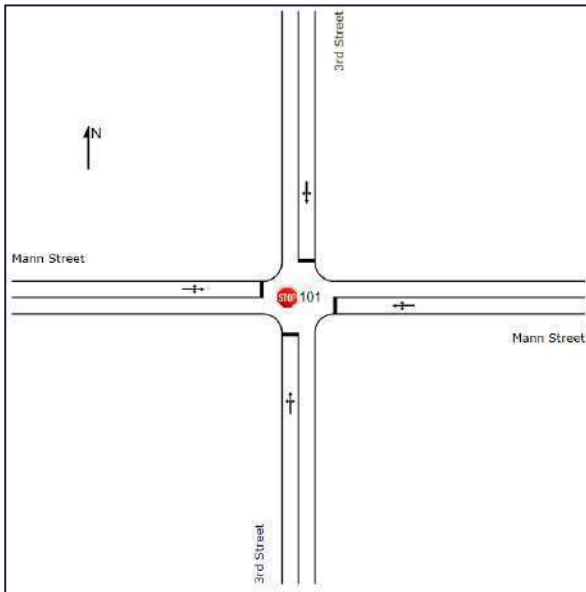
Existing Intersection Layout: 3rd Street and Mann Street
